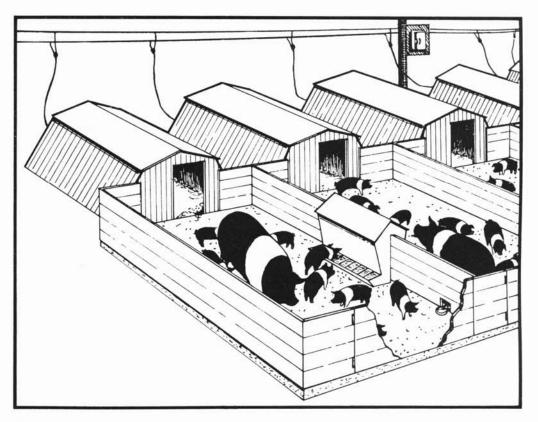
Portable houses pulled up to concrete slab for winter farrowing provide some advantages of central farrowing houses.
